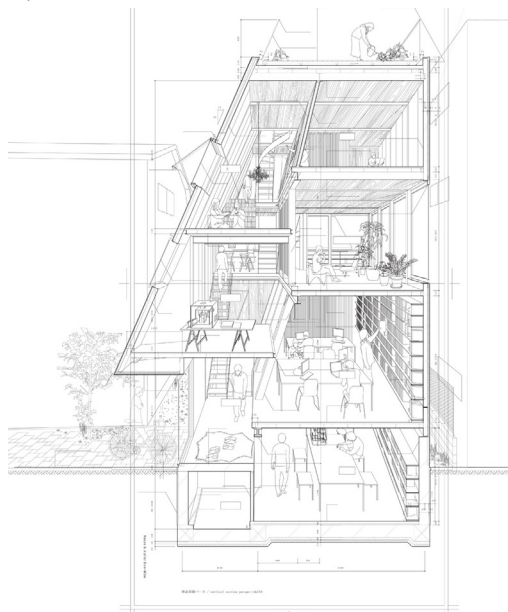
| Section of Atelier Bow-Wow's House and Studio highlighting the continuum of spaces.
